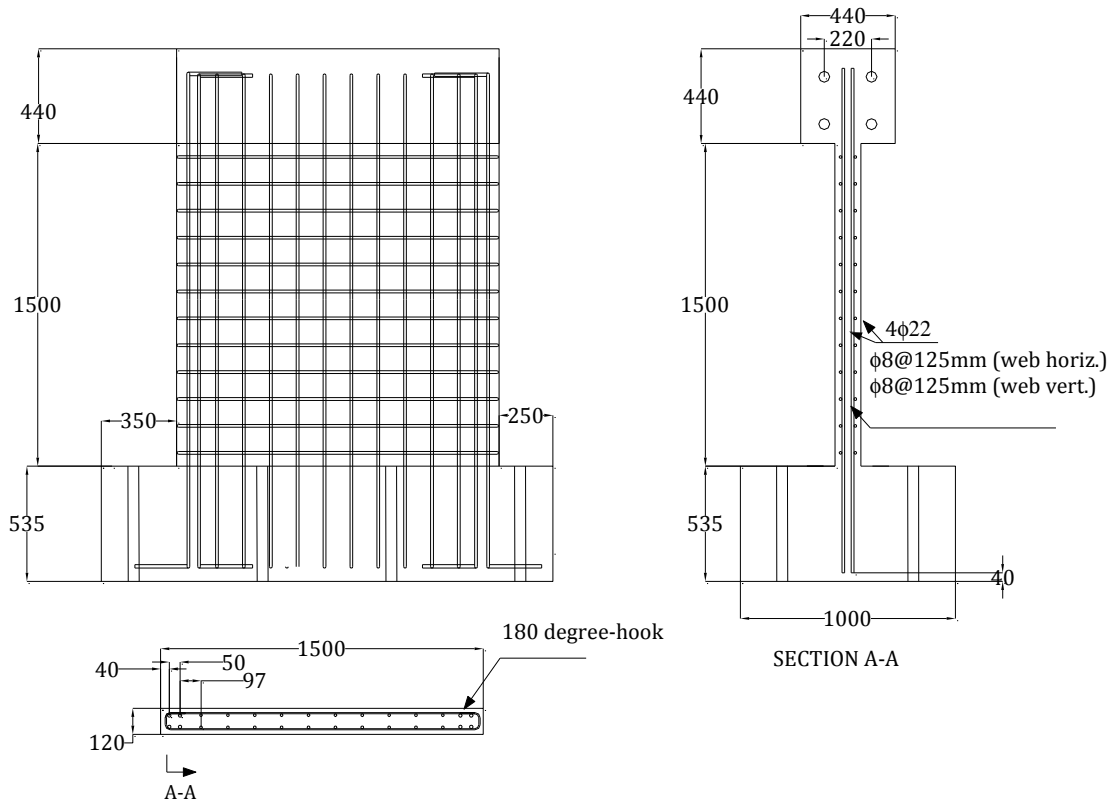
Geometry and wall reinforcement of specimen T6-S1.
